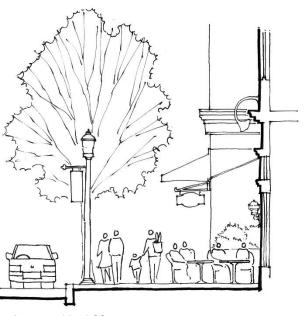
Adding street trees, awnings, textured pavement, and other site furnishings can help reduce the scale of a roadway and slow traffic.
